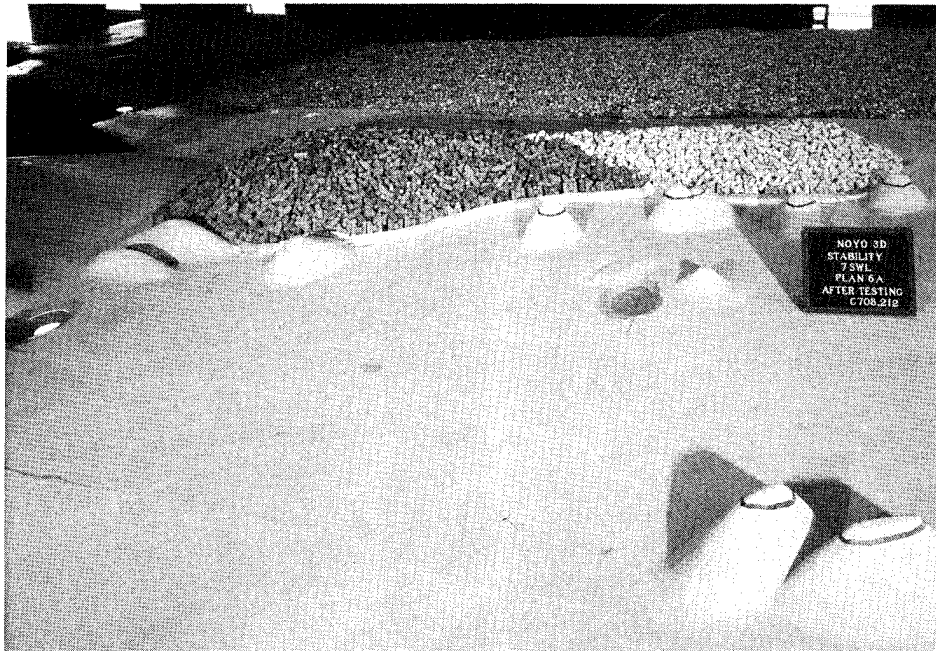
Sea-side view of Plan 6 after Storm IA waves
